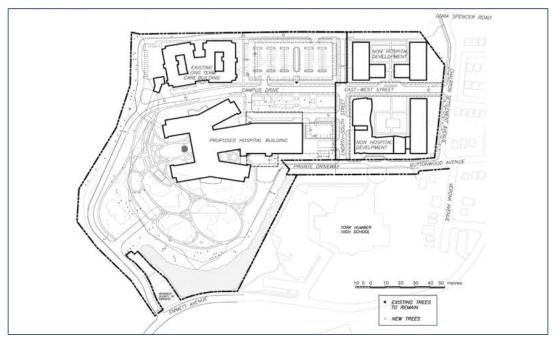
82 Buttonwood Avenue (West Park Health Care Centre) proposed site plan. Only the proposed hospital building is part of this current application.
